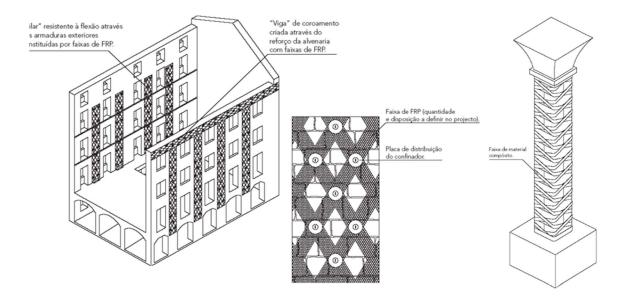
Application of CFRP/GFRP on building, wall and column (Meireles et al., 2013)
